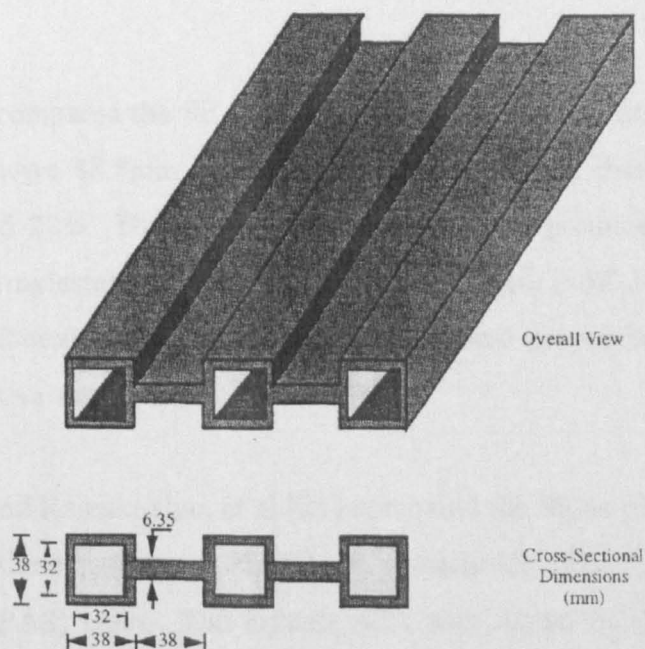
Schematic of flanged tubes tested by Karbhari [18]
